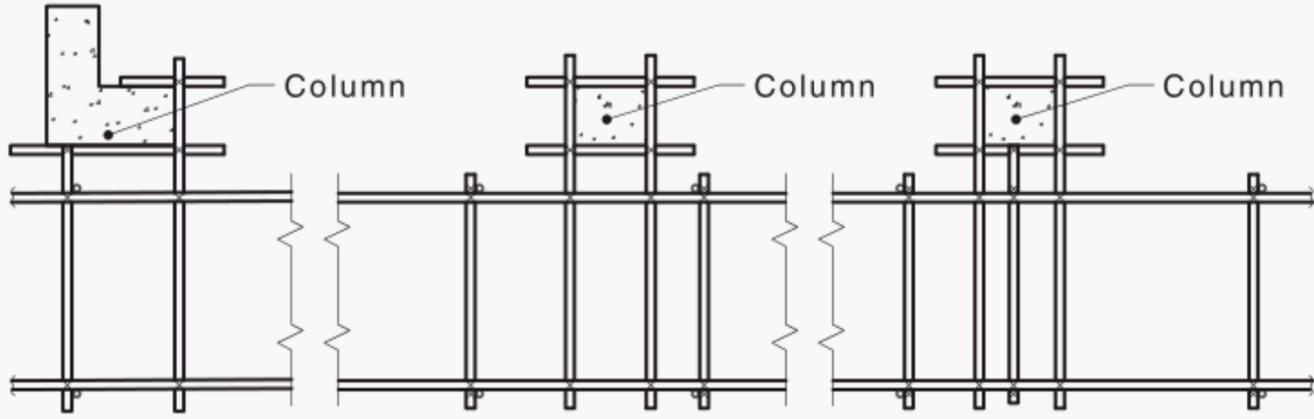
(B) — Typical tie assemblies — U-tie around structural column
